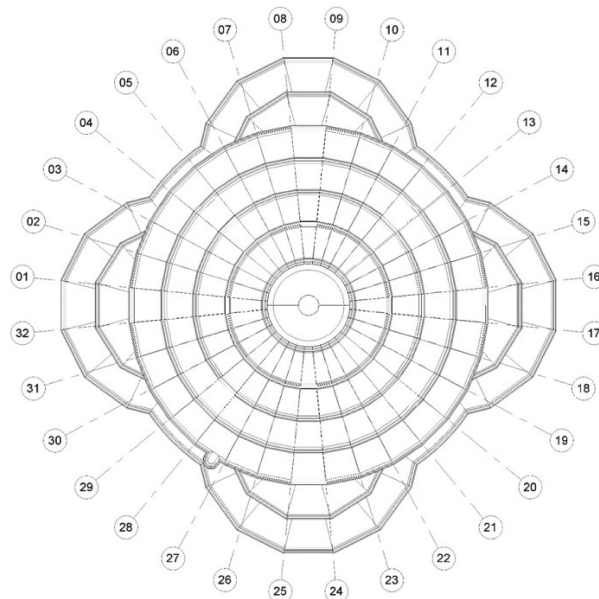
The floor plan of the roof structure of the Centennial Hall generated from the BIM model.
